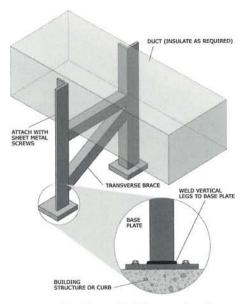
Duct mounted to the roof with cross bracing on a curb.
